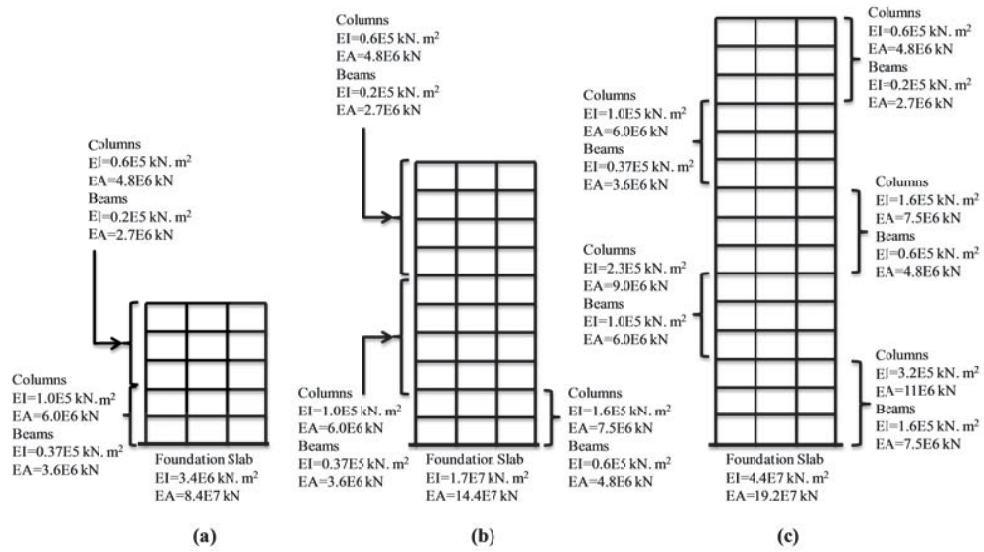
Concrete sections designed for the adopted frames based on elastic design method; (a) 5 storey model (S5); (b) 10 storey model (S10); (c) 15 storey model (S15)
